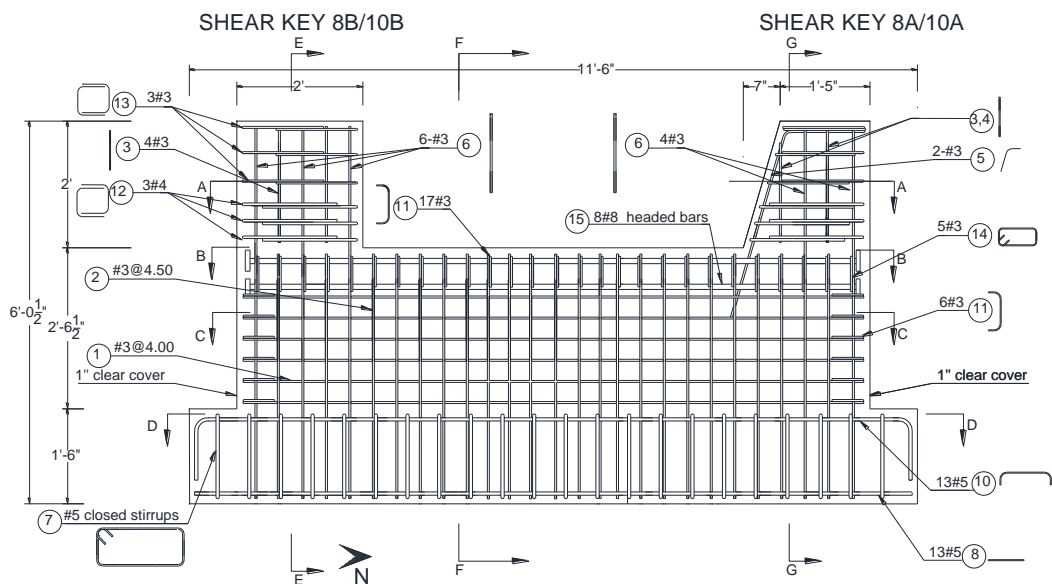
Elevation view of design details for Specimens 8 and 10
